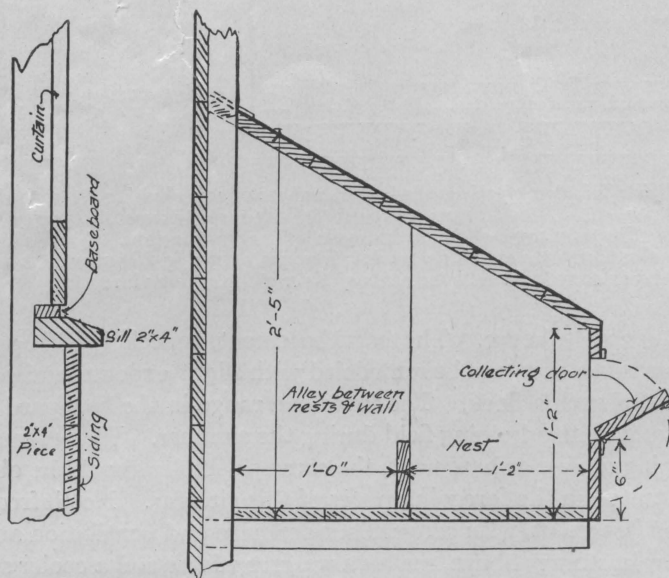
A detailed plan of the sill and baseboard construction for a cloth curtain, and a detail of nest construction for side-wall use
